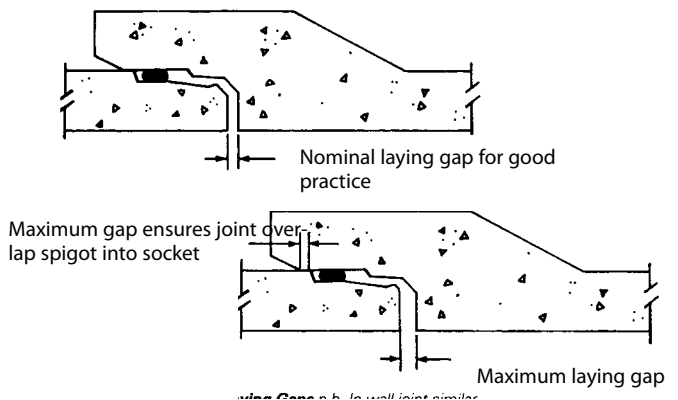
, Rubber Ring Joint Laying Gaps n.b. In-wall joint similar
